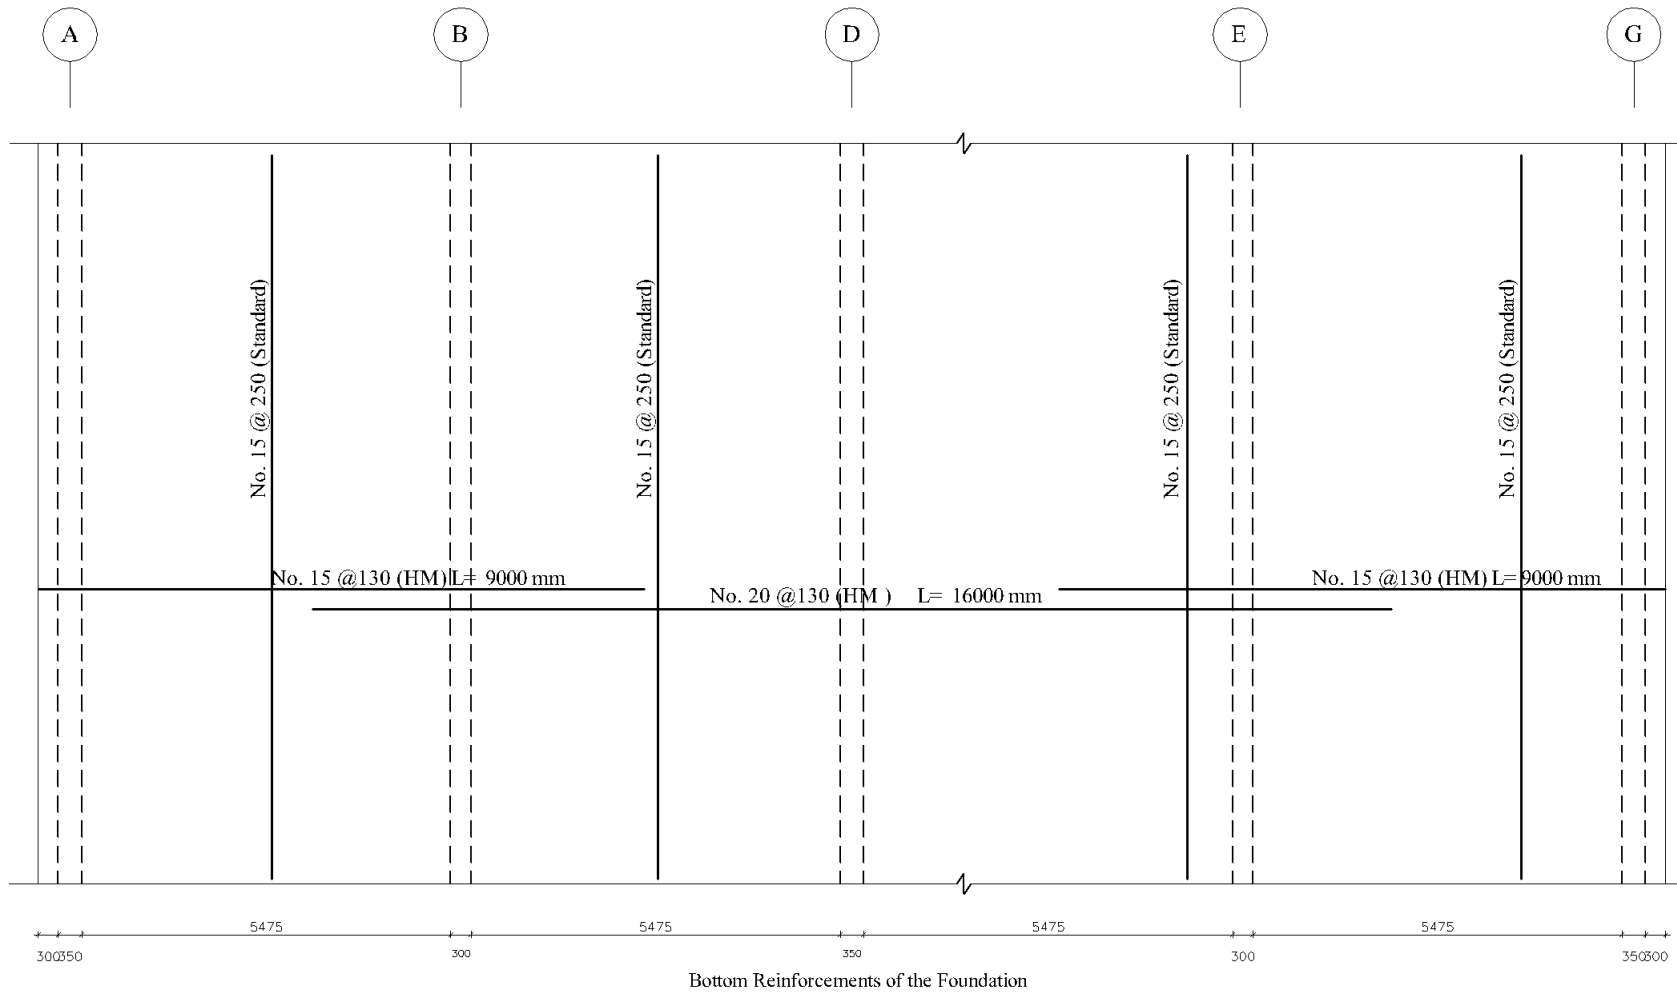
Details of bottom reinforcements of the foundation (Plane)
